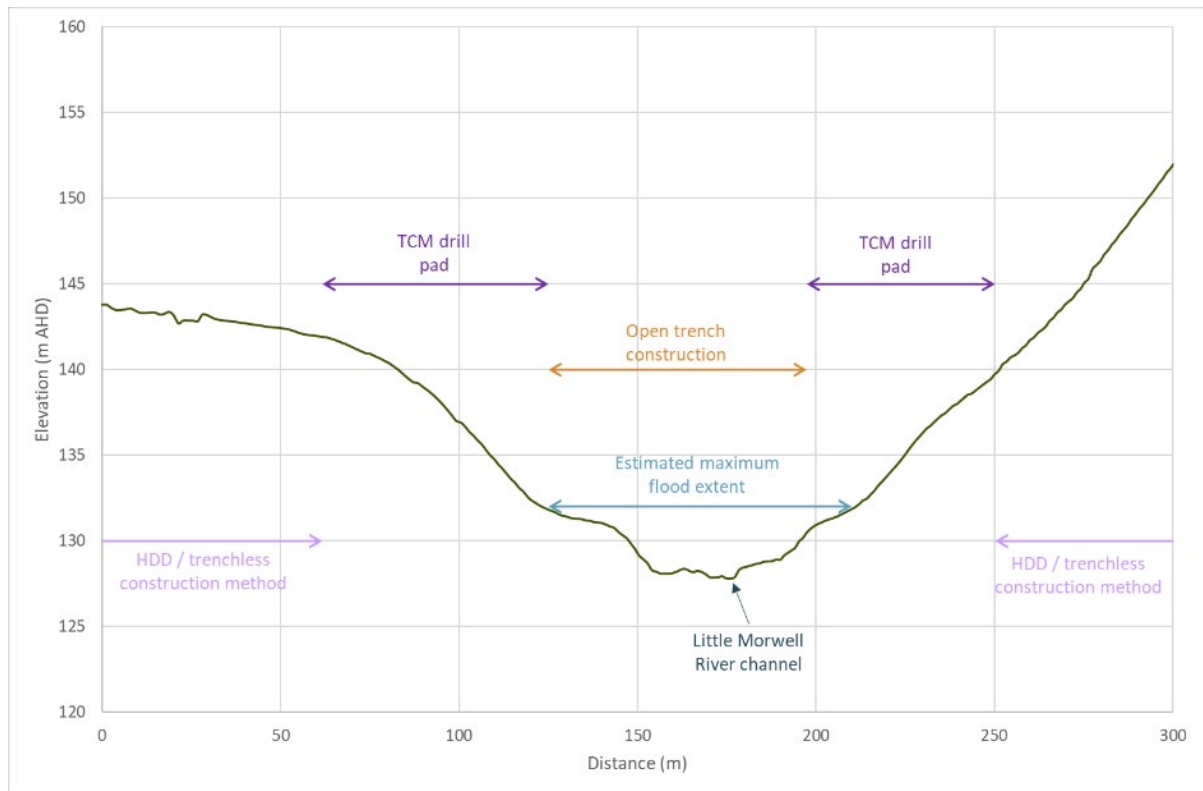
Schematic cross section layout of construction assets surrounding Little Morwell River crossing, looking downstream along proposed project alignment
